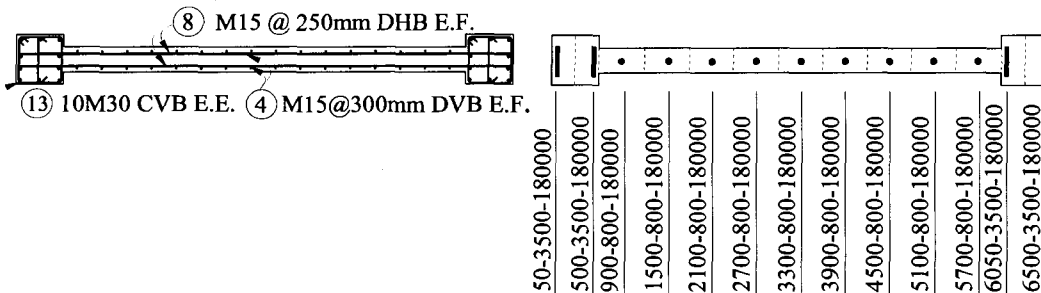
Modeling of shear wall sections for B18 located in Vancouver(cont.)
